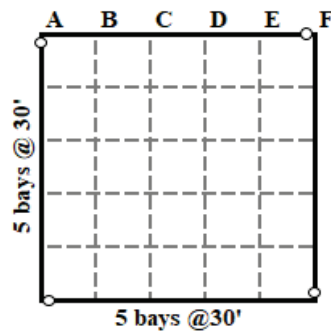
Baseline SDC B_{\max} steel moment frame building typical 9-story plan.
